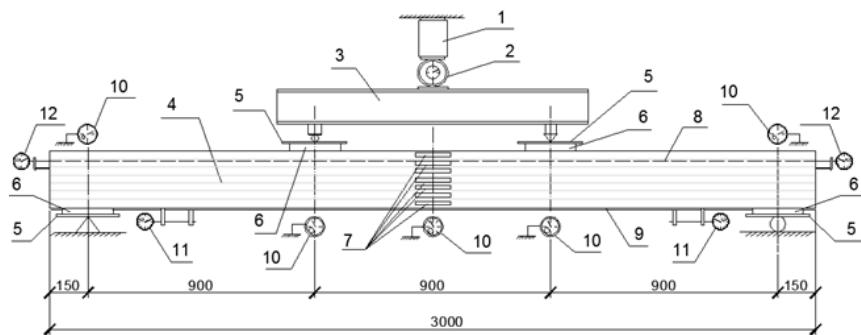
Test setup scheme for bending tests of timber beams: 1) jack; 2) dynamometer; 3) steel crosshead; 4) tested beam; 5) steel pad; 6) wooden pad; 7) strain gauges; 8) steel reinforcement 2 Ø A500C; 9) composite strip reinforcement Sika CarboDur S-512; 10) deflectometer 6-PAO; 11) indicator ICh-10n; 12) indicator ICh-10h
